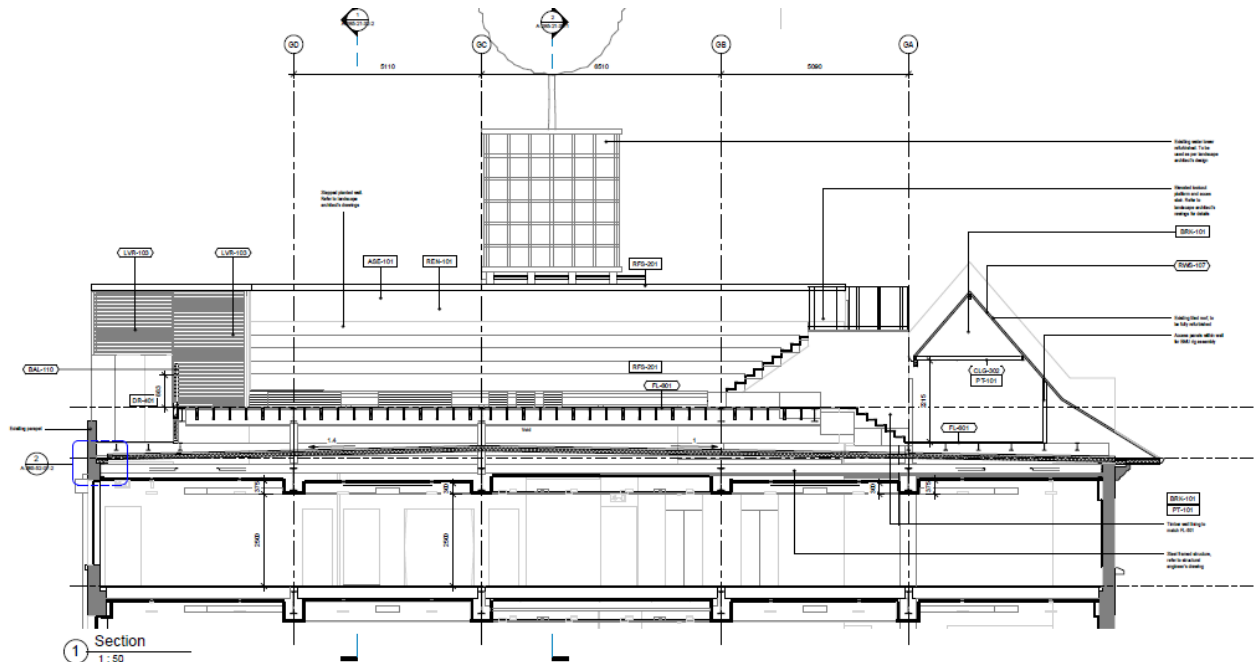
Proposed new roof section. (Source: Make, drawing number -285-51-02-1, issue 4 [for information], 6 March 2019)
